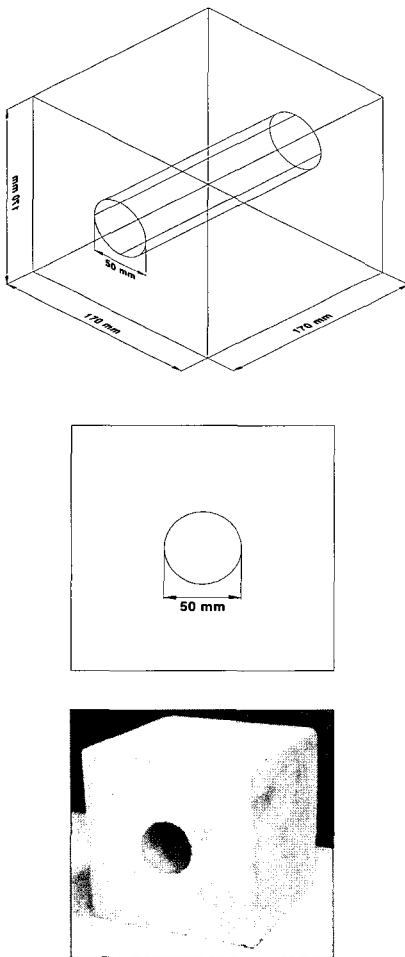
Isometric and front view of specimen and photo of specimen with opening
